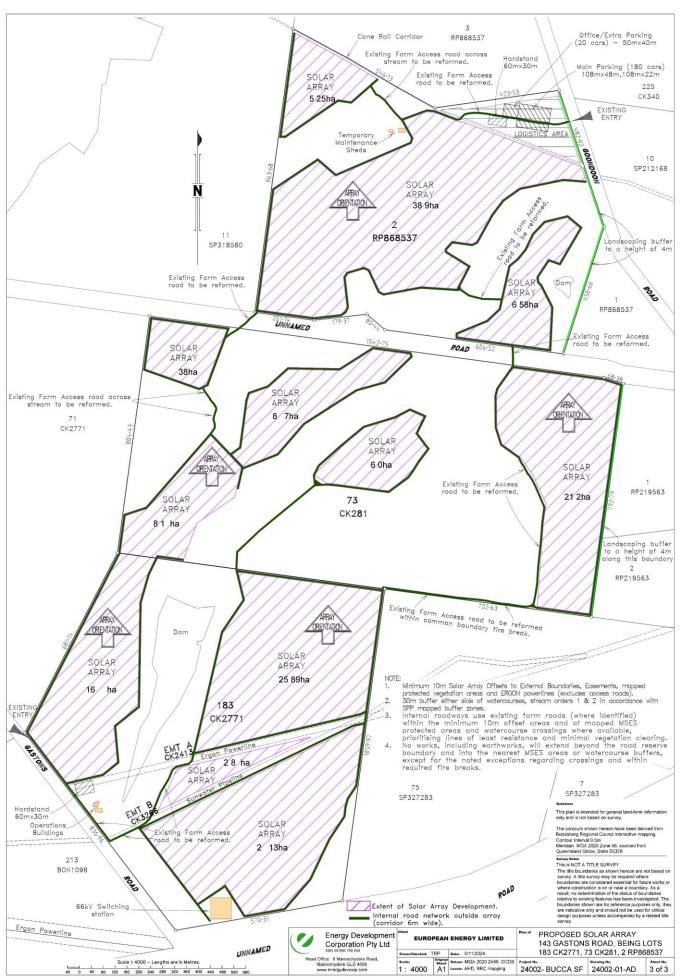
EDC Plan 24002-01-AD Proposed Solar Array Layout 3 of 3
